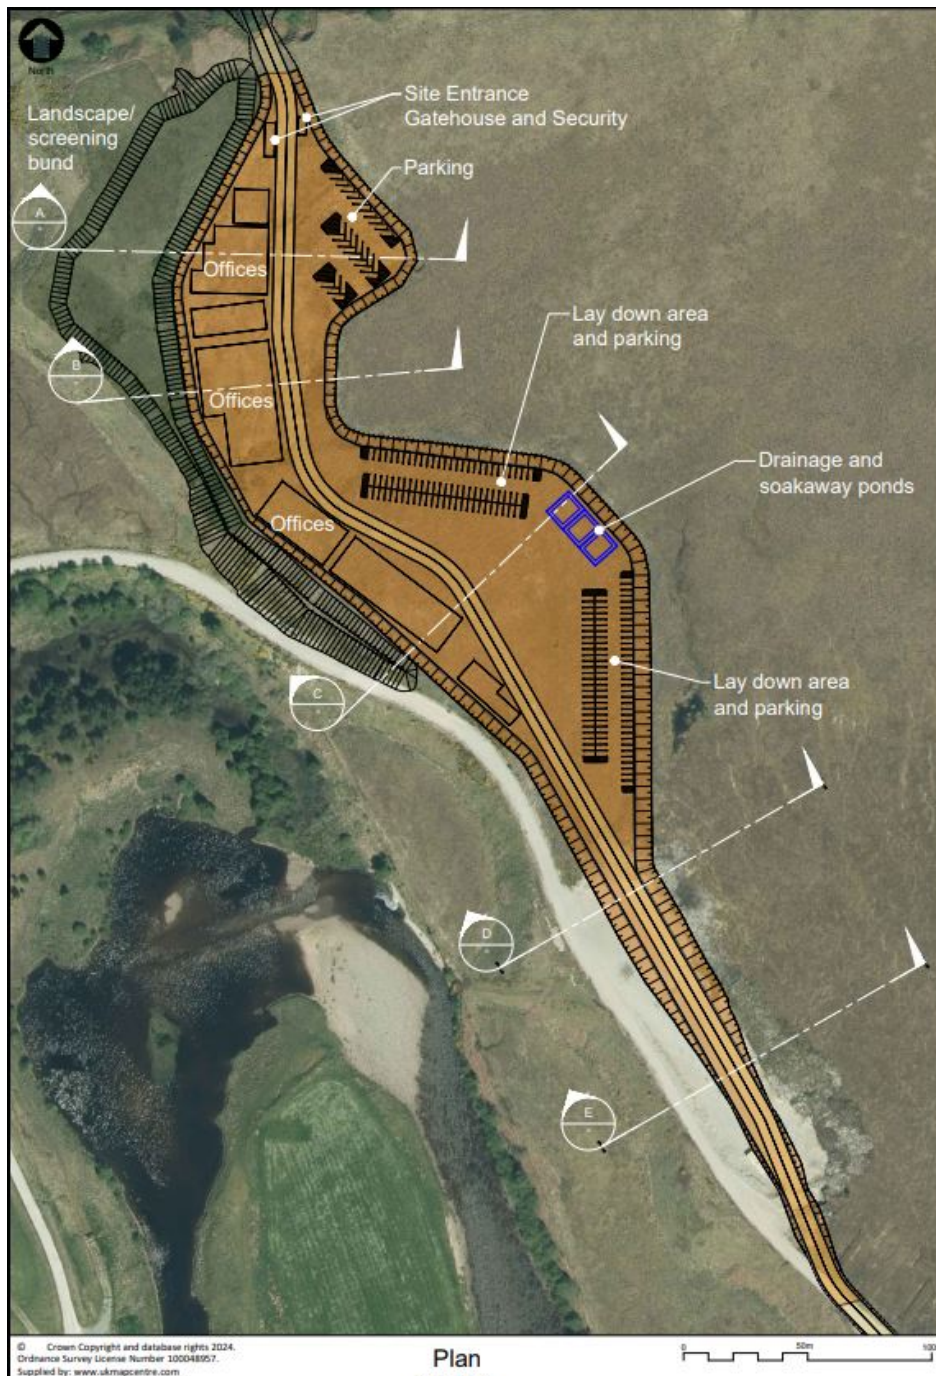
Plan of Site Compound SC1 and Borrow Pit BP1 at Moy
